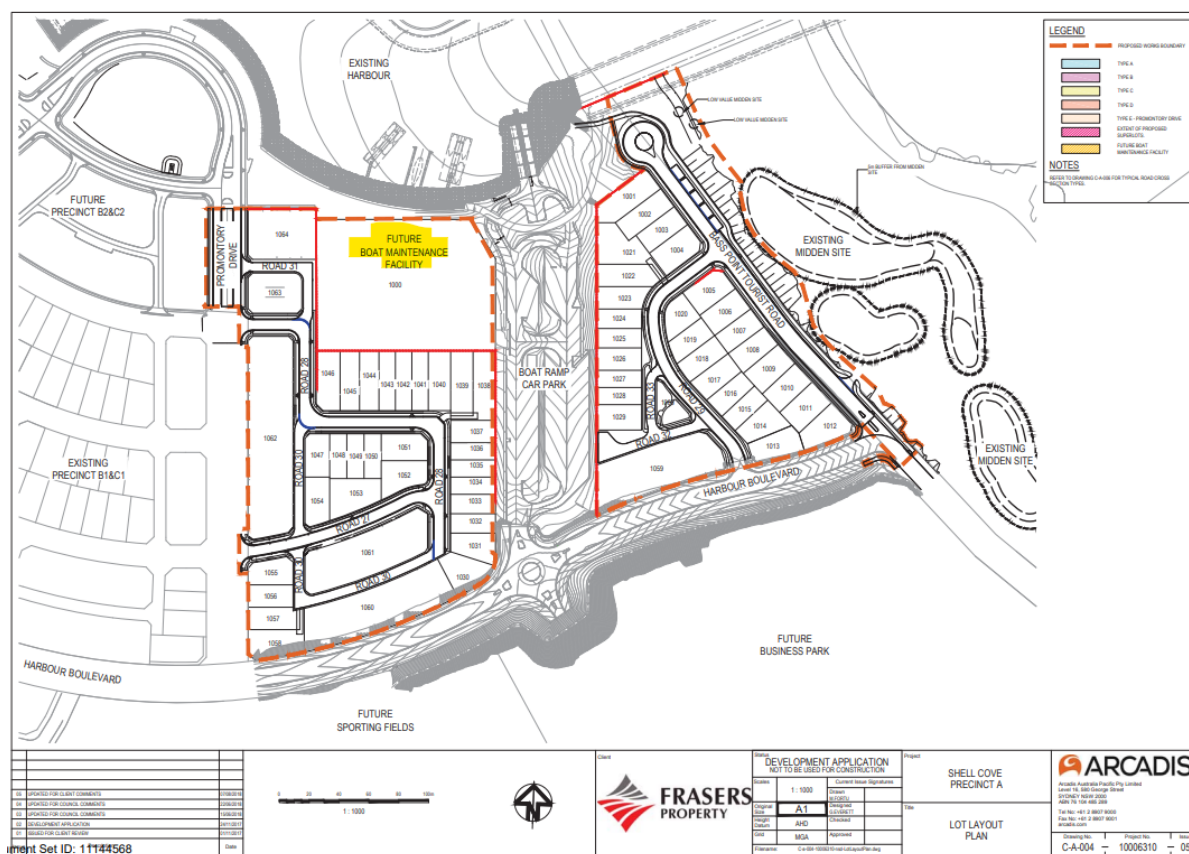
DA0619/2017 Approved Subdivision Plan (relevant lot highlighted)
